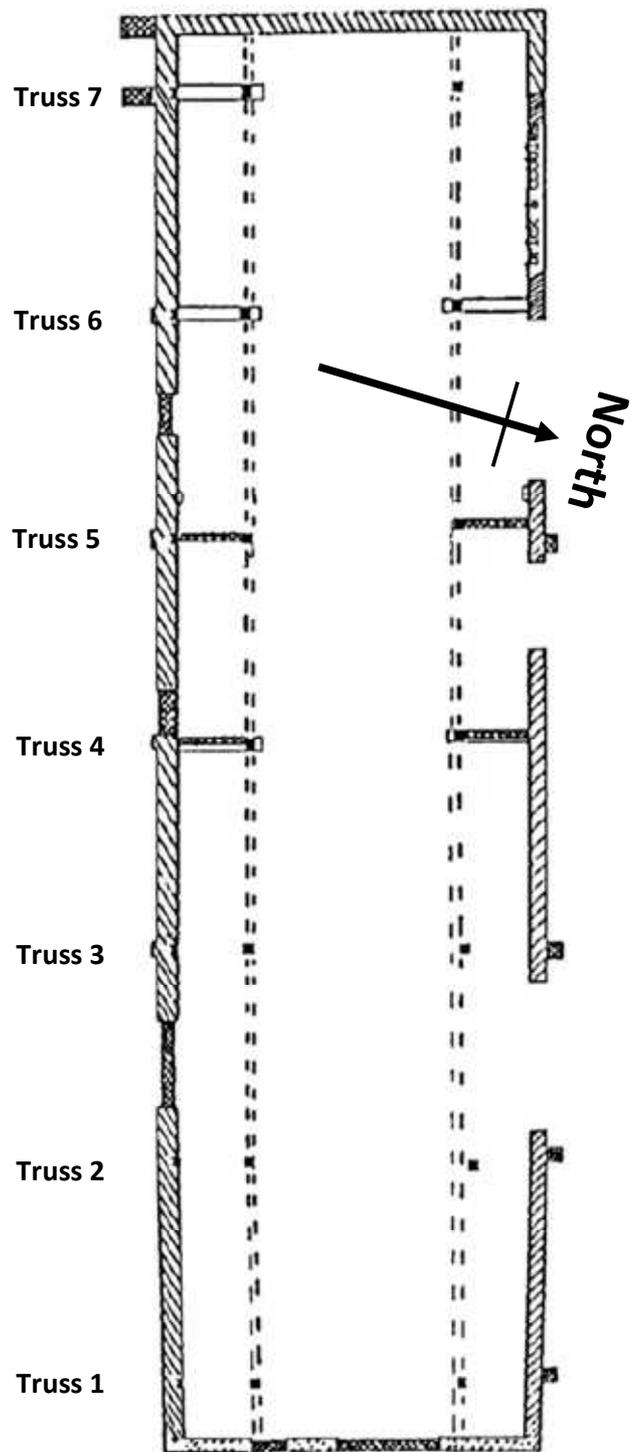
Plan of Hall Farm Barn, Hemsby, to show the layout and arrangement of the trusses (after John Walker)
